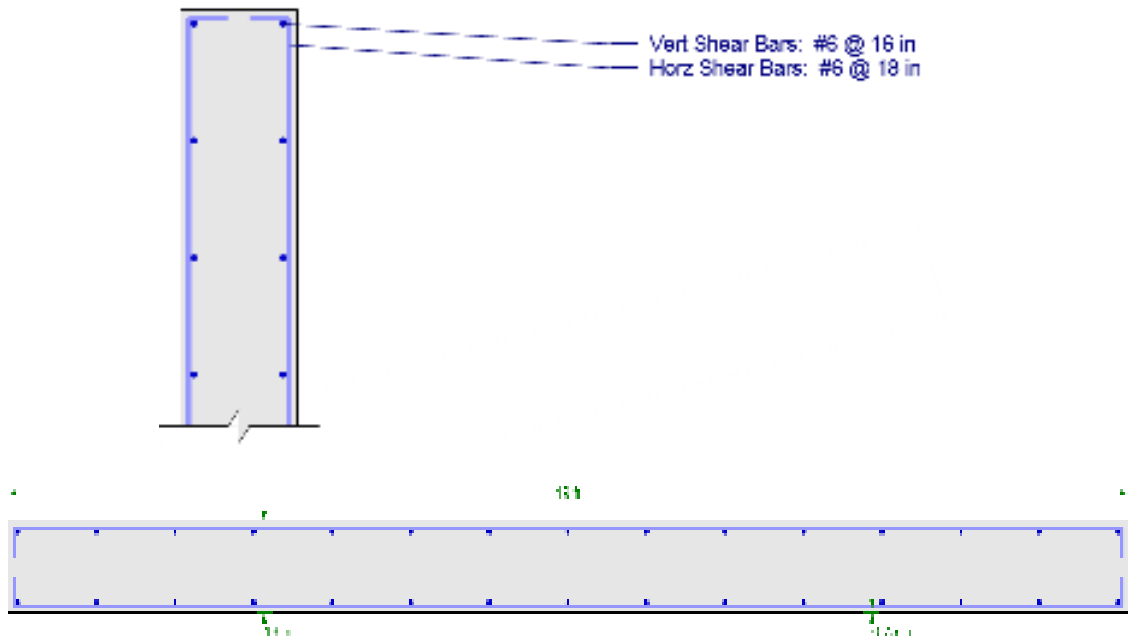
Building (B5-9S-H-S) Special RC Shear Reinforcement Details; Wall Section for Floors 7-9
